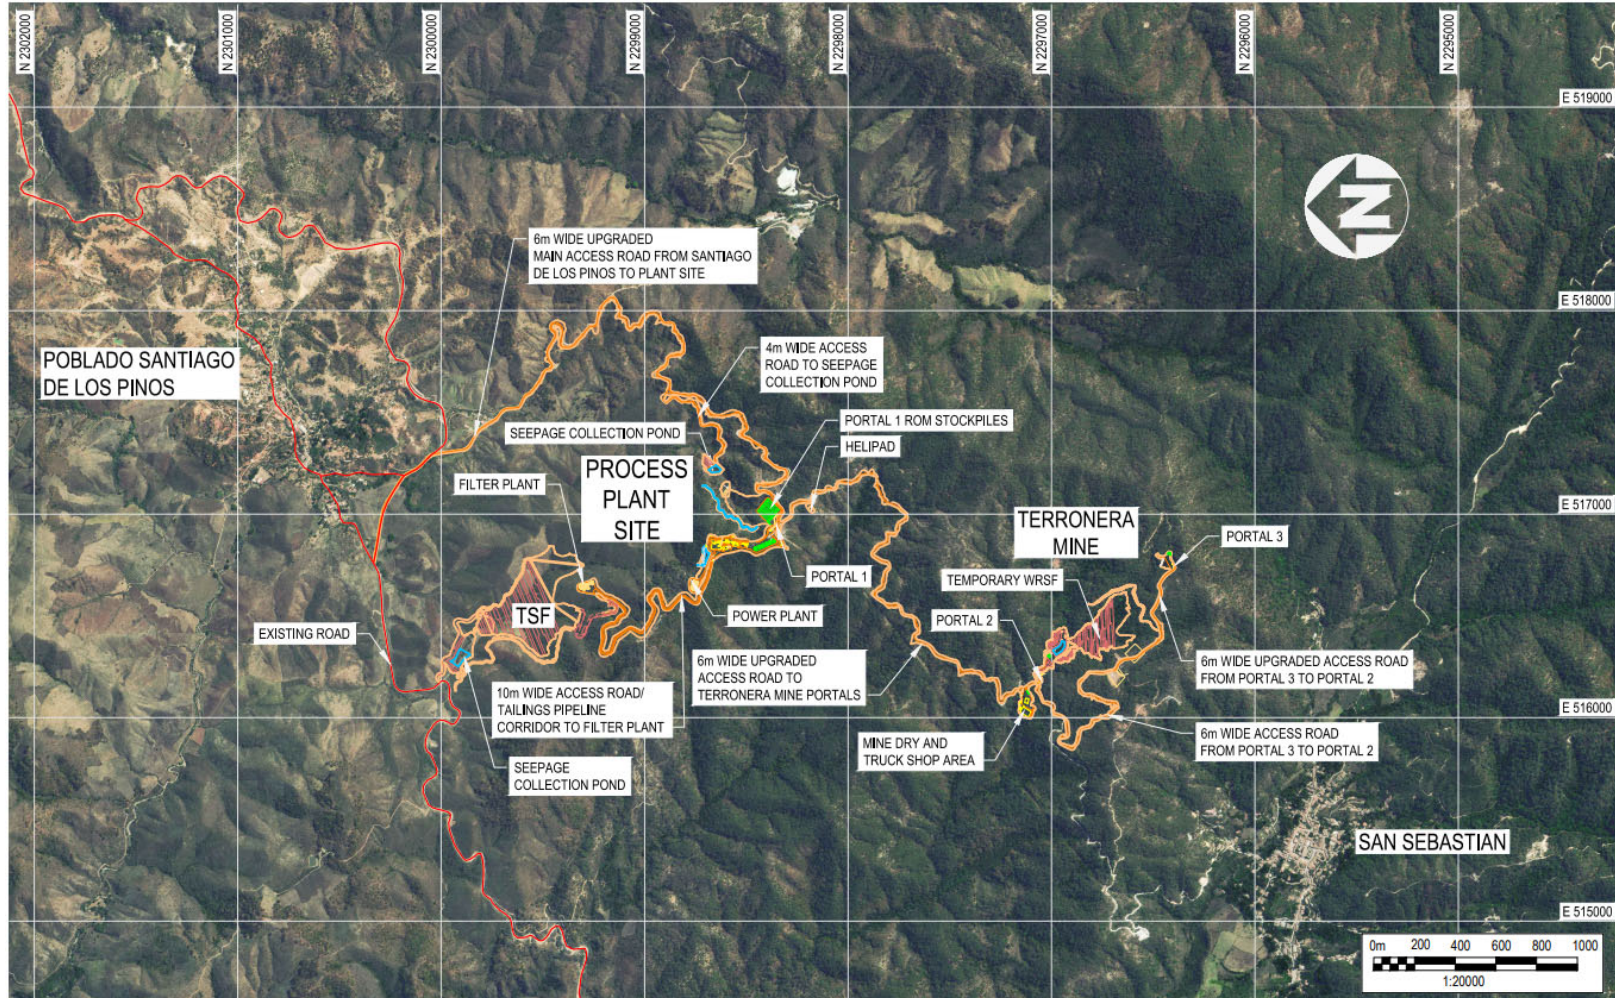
Terronera Site Layout (prepared by Wood, dated 2021)
